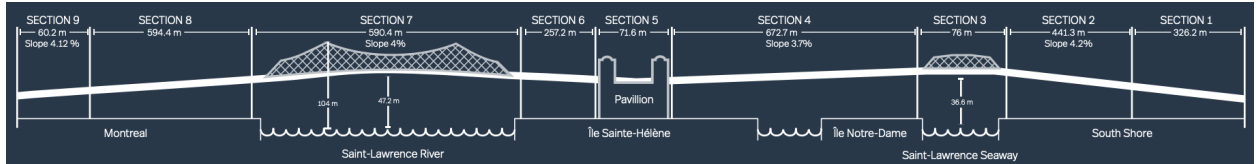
Illustration of the not-to-scale schematic elevation (upstream view) of the Jacques Cartier Bridge. The bridge has 40 spans grouped in 9 different sections. The figure is reproduced from the Jacques Cartier Bridge technical data sheet [4].
